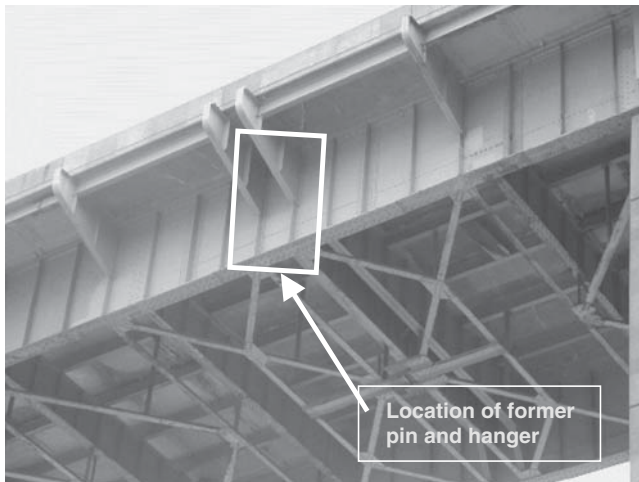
Typical complete girder splice installed to replace a pin and hanger connection in a two-girder bridge.
